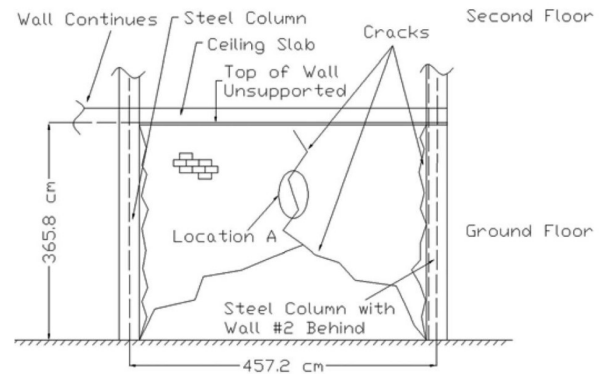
Pattern of cracks developed on the ground floor partition wall (Wall #1) (Zapata J. B. and Weggel C. D., 2008)
